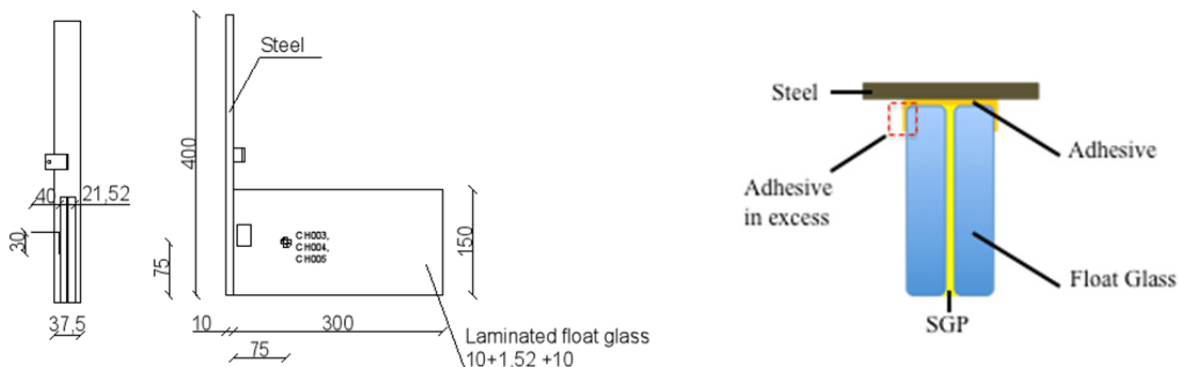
Push-out shear test layout, nominal dimensions in millimeters.
